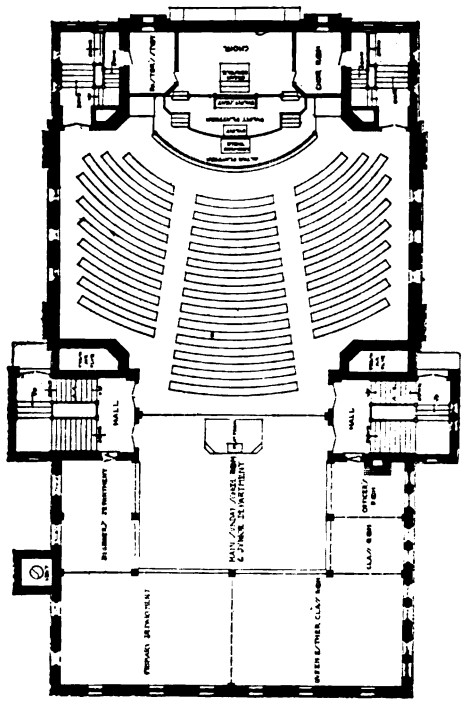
FIRST METHODIST CHURCH, CLINTON, IND.—MAIN FLOOR PLAN.
